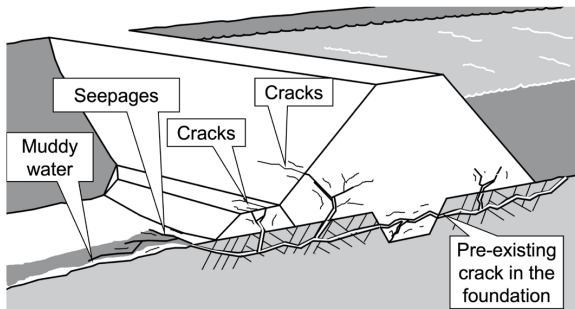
Piping into pre-existing fractures. Pre-existing fractures in the foundations can facilitate the occurrence of piping, which is initially manifested by cracks, seepages with muddy water, and/or fines from the foundation (Mejia, 2013).
